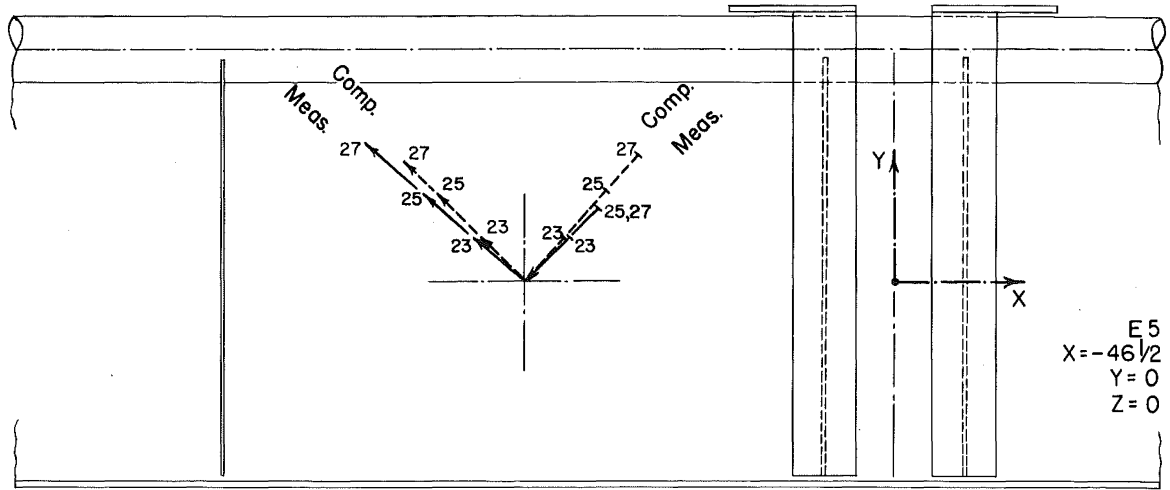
Principal Stresses at Panel Center, Girder E5
